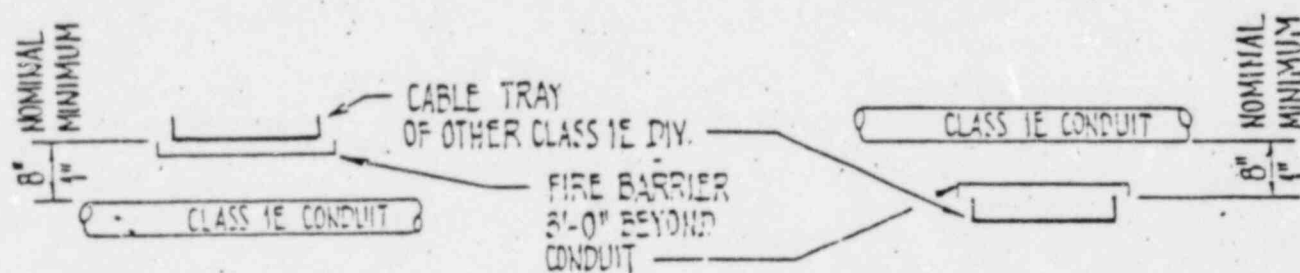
CONDUIT SPATIAL SEPARATION:
